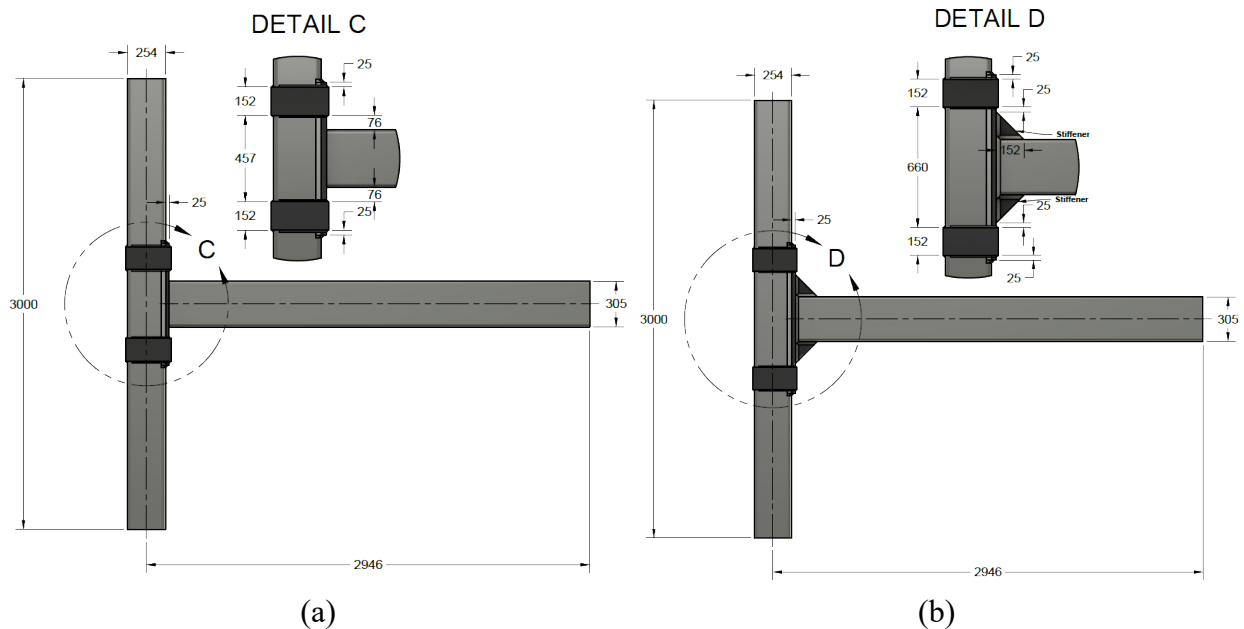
Elevation view of the tube-based collar connection (a) without and (b) with beam endplate stiffeners. (Units: mm)
